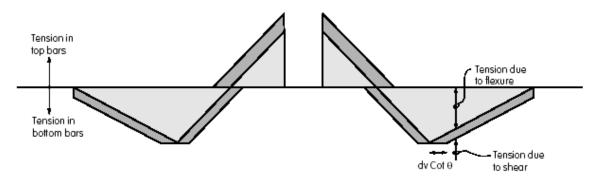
Variation of Force in Longitudinal Steel of 2-Span Pre-cast Girder Bridge with an Inverted-T Bent Cap (Notes to Fig. 4: 1. Dapped ends at the bent cap mean that girders are indirectly supported, and that shear demand in longitudinal steel must be considered at the center support, as shown above. 2. Not to scale. 3. Enveloping of tension due to maximum positive and maximum negative flexure is not shown. In other words, the
